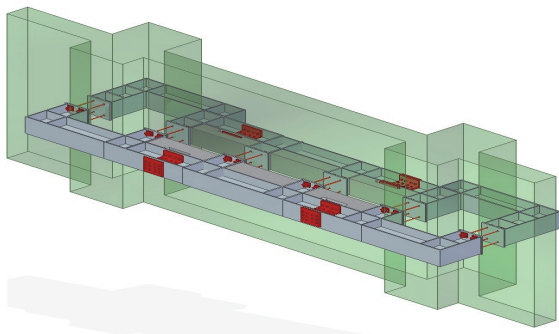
Conceptual drawing of strengthening plan for wall and column of the structure
